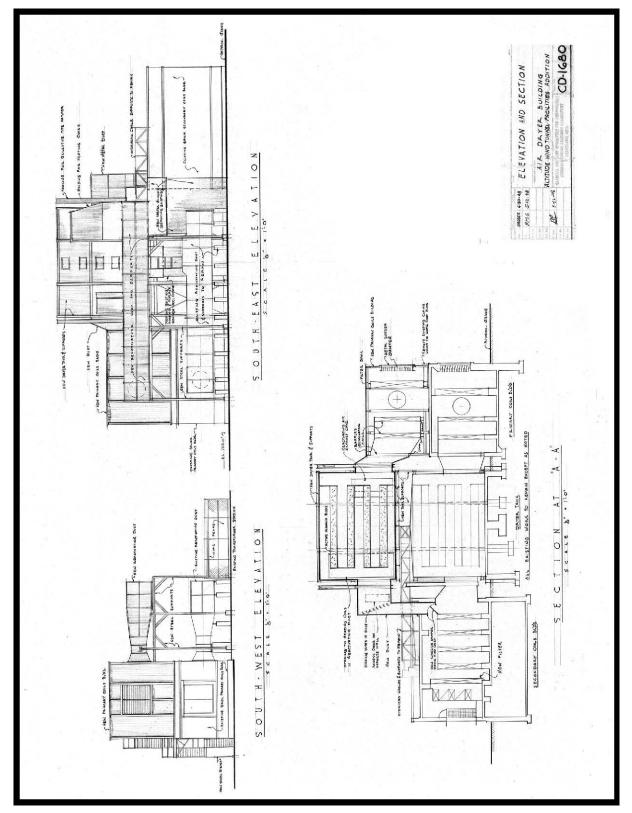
Elevation drawings of the Air Dryer Building, 1948 (OH_Cuyahoga_AWT-Support_080).
